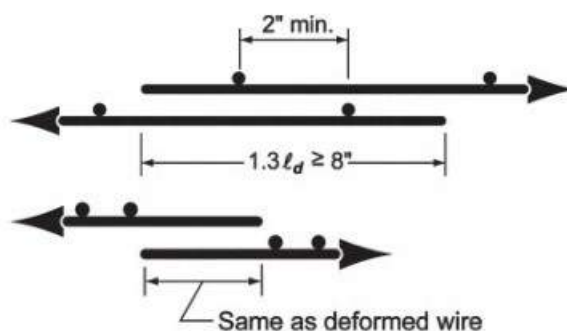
Lap Splices of Deformed Welded Wire Reinforcement (adapted from ACI 318-14, courtesy of ACI)
